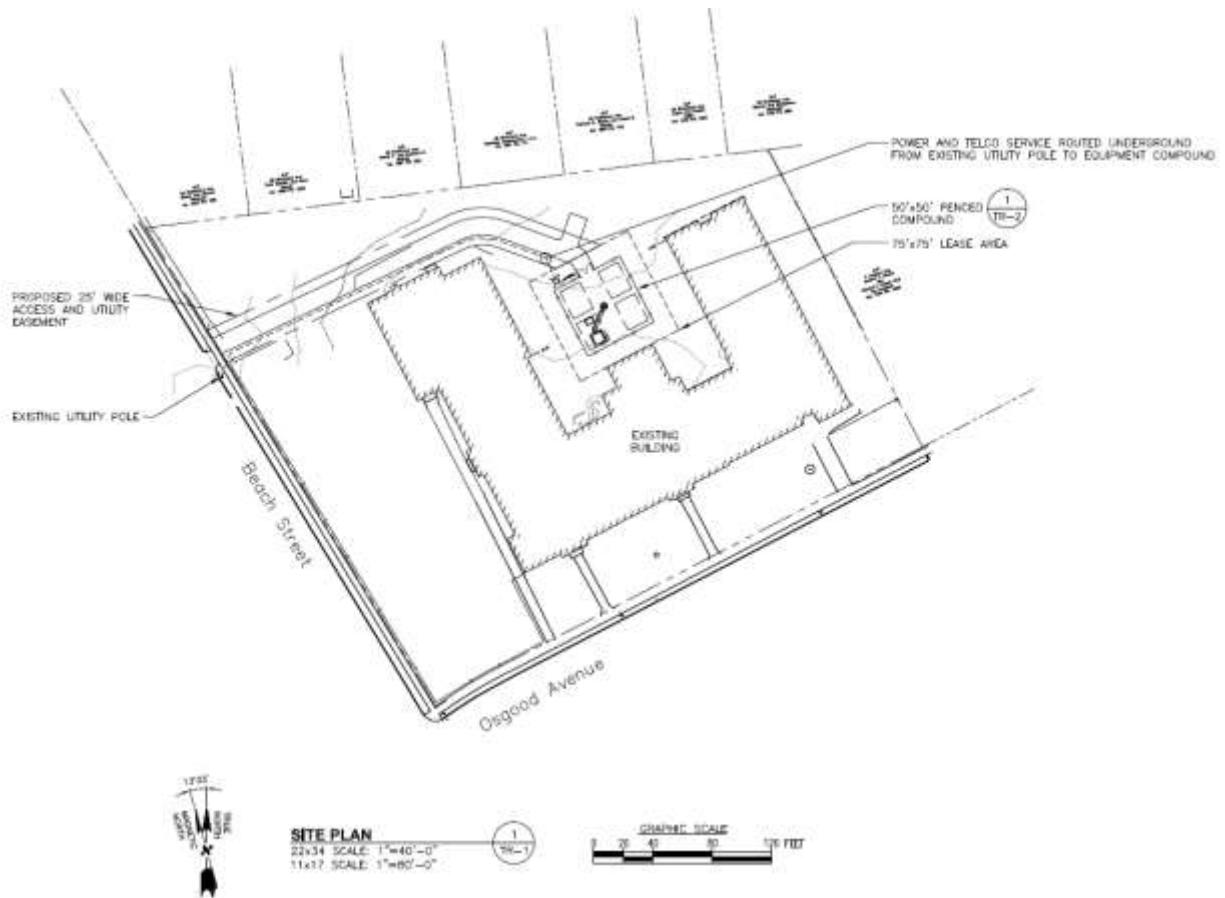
Site Plan and elevation: Proposed Tower Location
